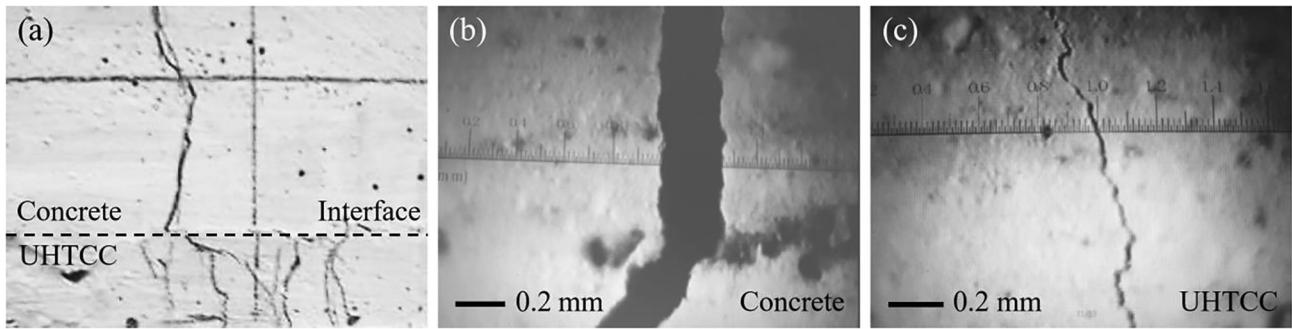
Local cracks in specimen UH20 at the load of 60 kN: (a) cracking mode; (b) crack at the concrete layer; (c) crack at the UHTCC layer.
